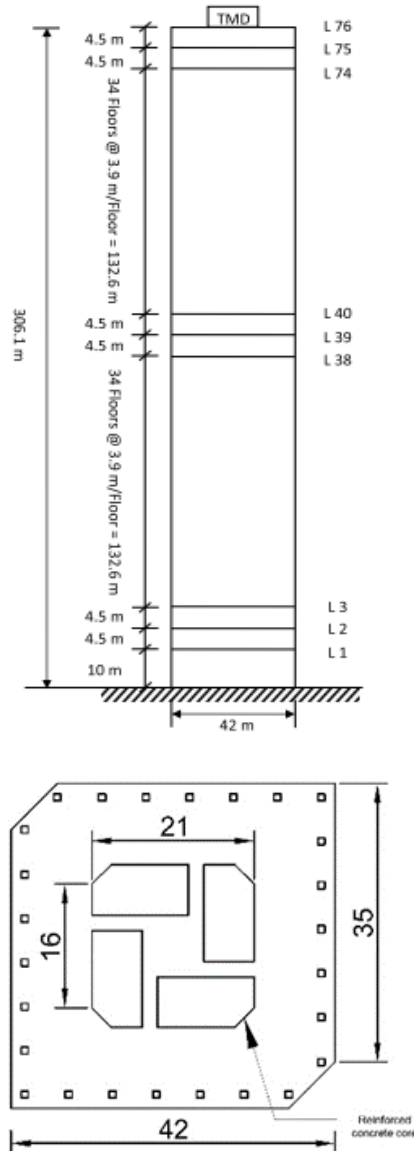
Plan and Elevation of the 76-storey building (Yang et al. (2004))
